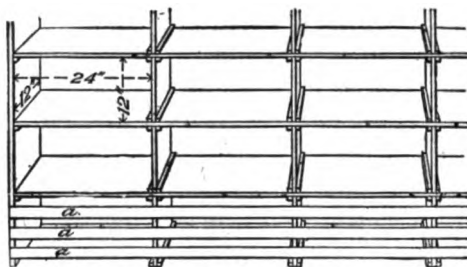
Lower tiers of a stack of nest boxes with open space below protected by slats (a)
